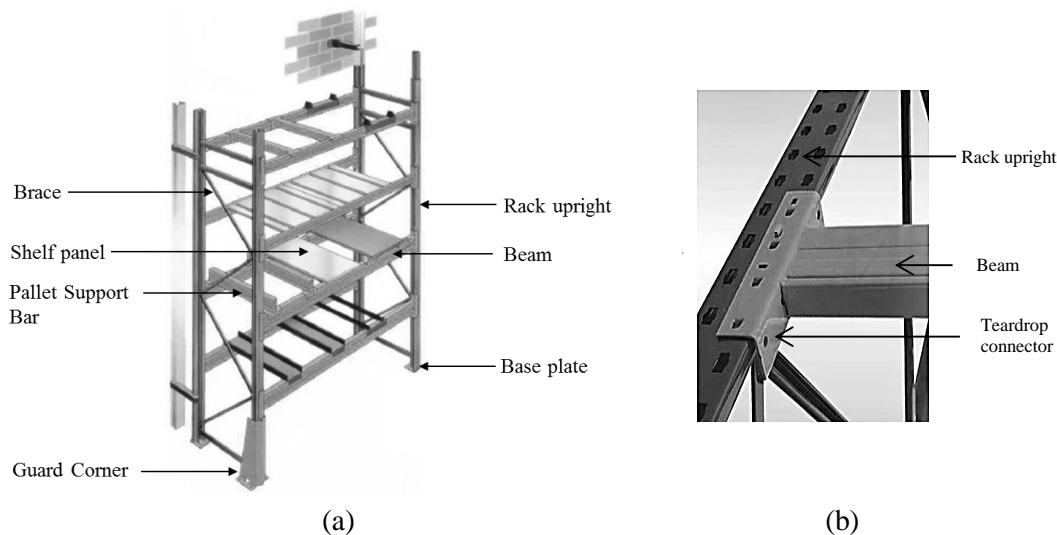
(a) Basic components of a steel storage rack (b) Teardrop connector (adapted from Saar Lagertechnik GmbH (2010))
